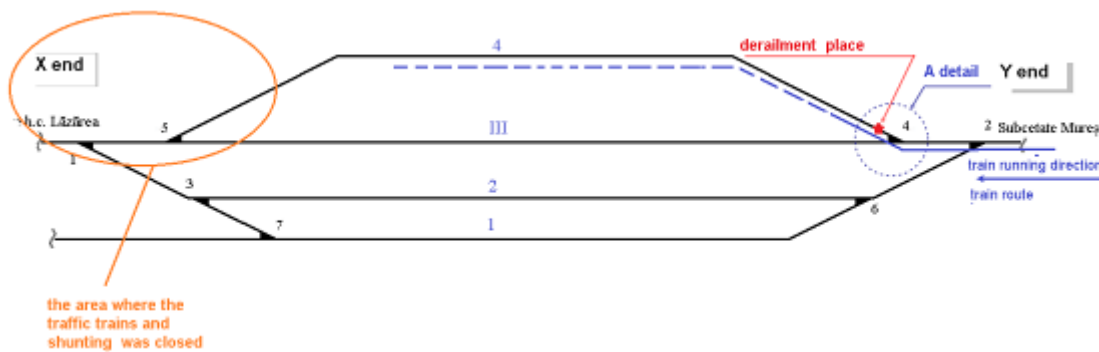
Ditrău railway stations- tracks layout adapted from [12]
